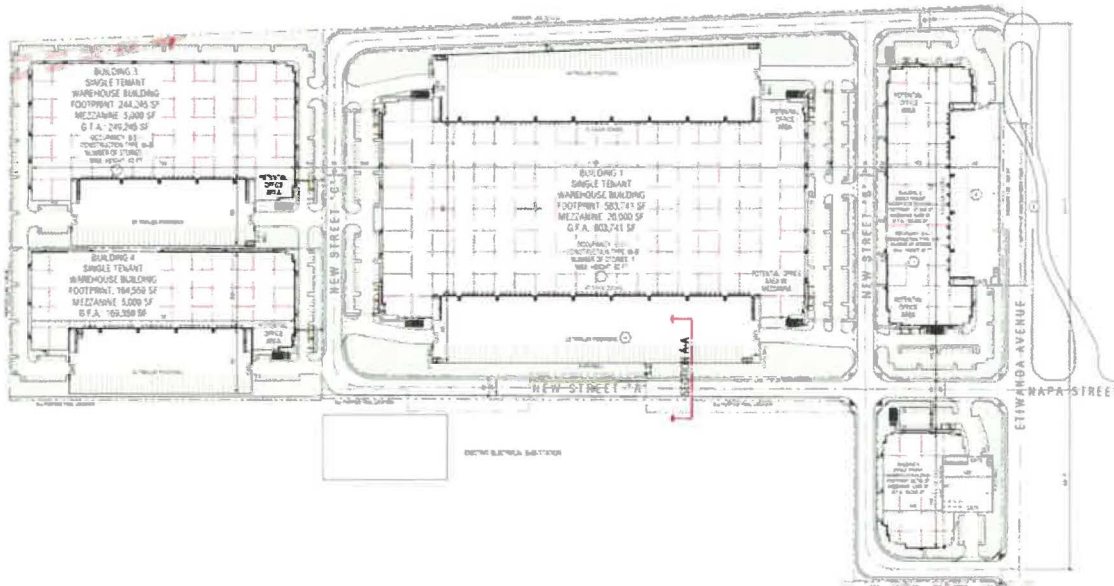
Conceptual Site Plan for Phase 2 of Etiwanda Commerce Center
